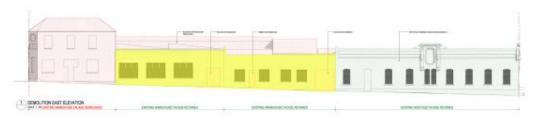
The section of wall that is sought to be demolished and reconstructed in the present amendment to the approval is coloured yellow.
